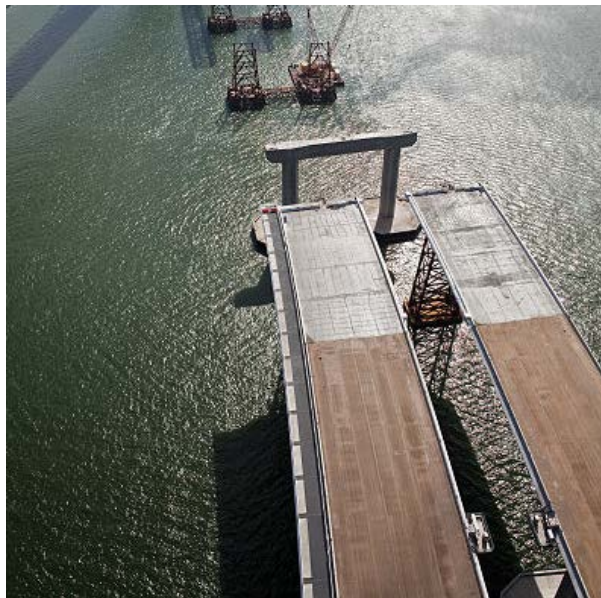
The construction of the new SF-Oakland Bay Bridge using the unidirectional cantilever construction method (Katz, 2011).
